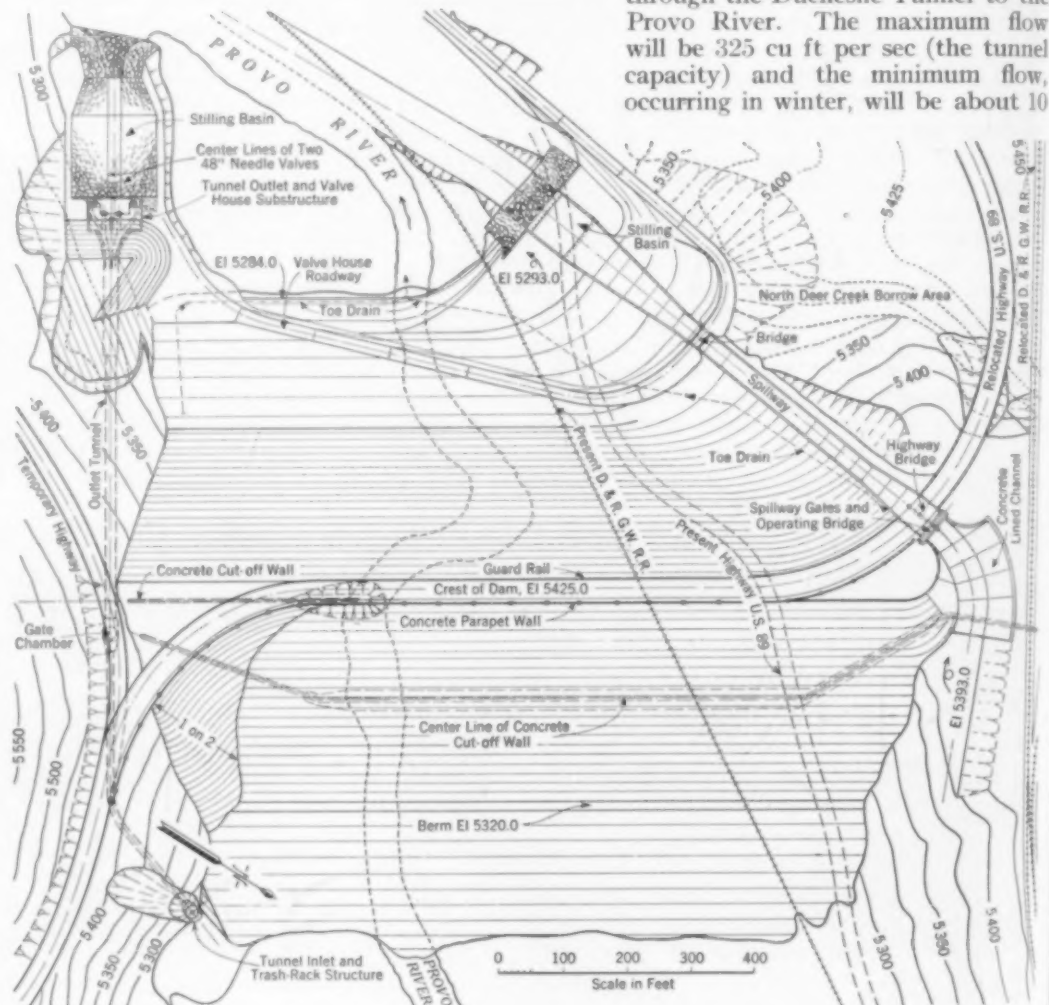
GENERAL PLAN OF DEER CREEK DAM
